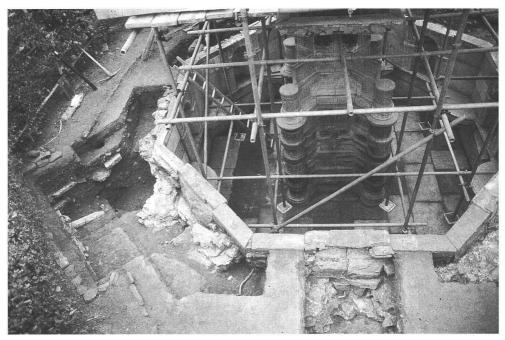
Bolsover Castle: excavation in progress around the tank of the Venus Fountain, showing, at bottom centre, one of the remaining lead-pipes.
